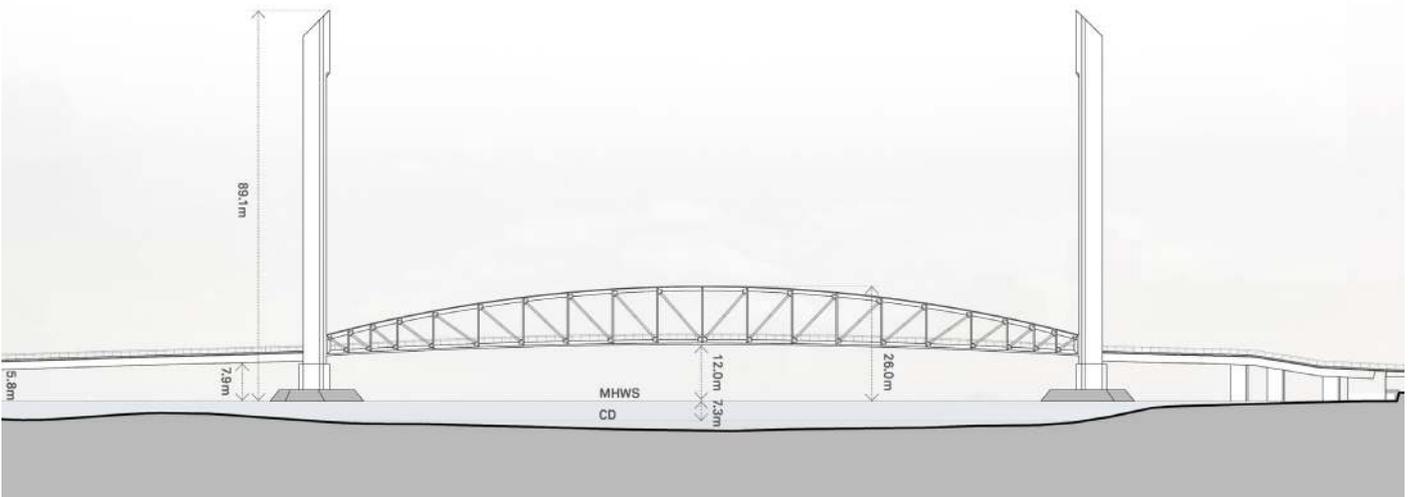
Elevation of the Rotherhithe to Canary Wharf Crossing, showing the design of the truss and of the towers
